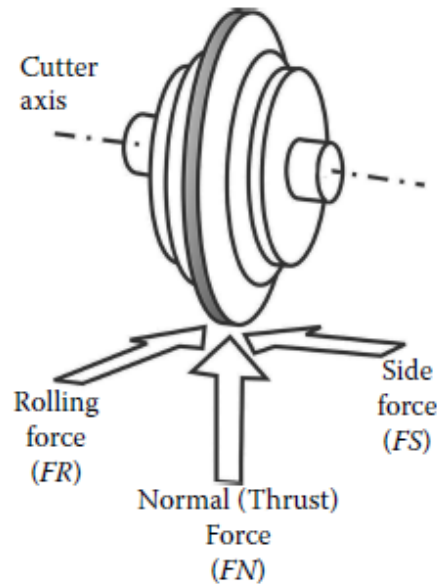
Sketch of a typical disk cutter used in full-scale linear cutting machine
